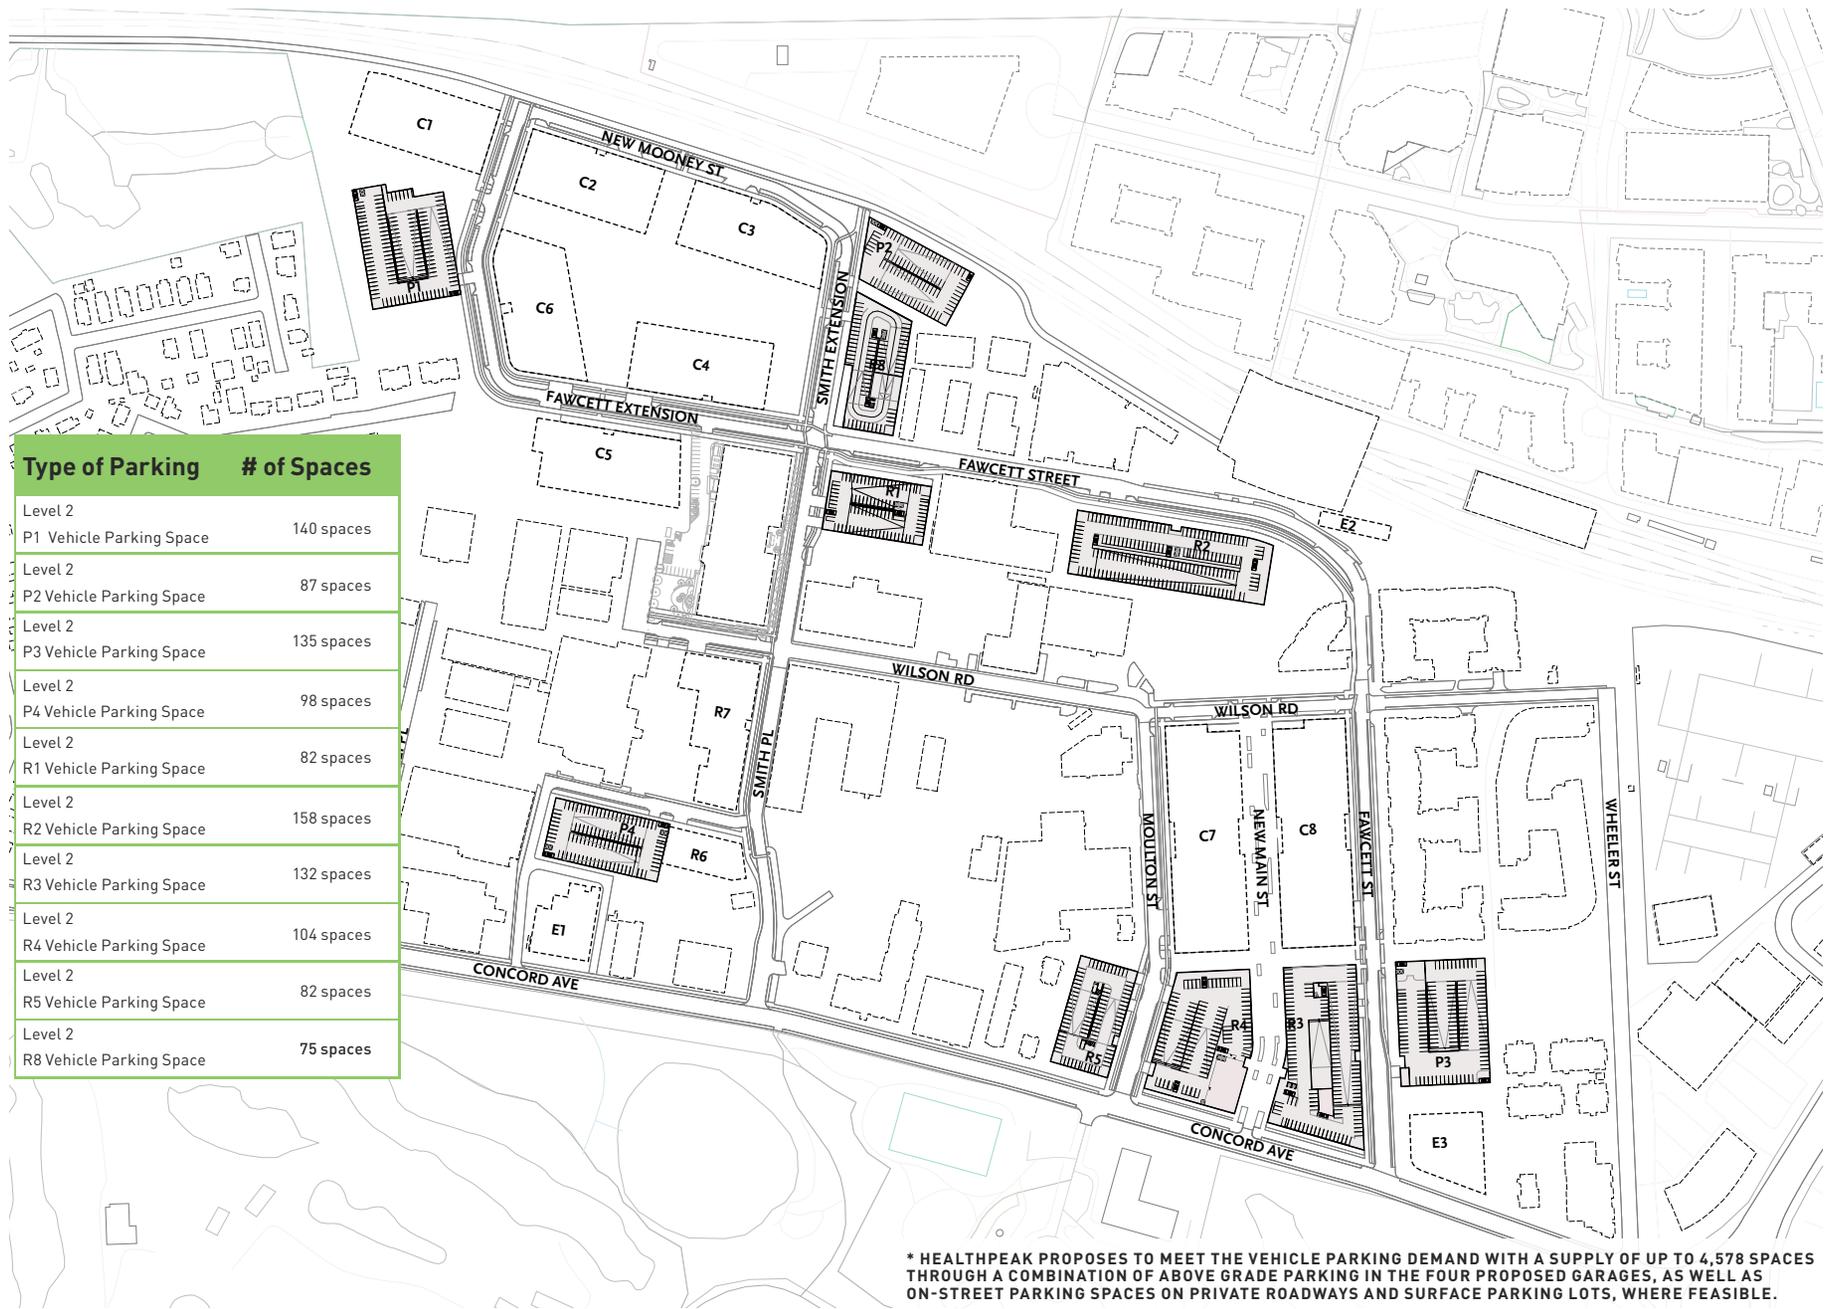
C.4: Parking Facilities - Level 1 Plan
